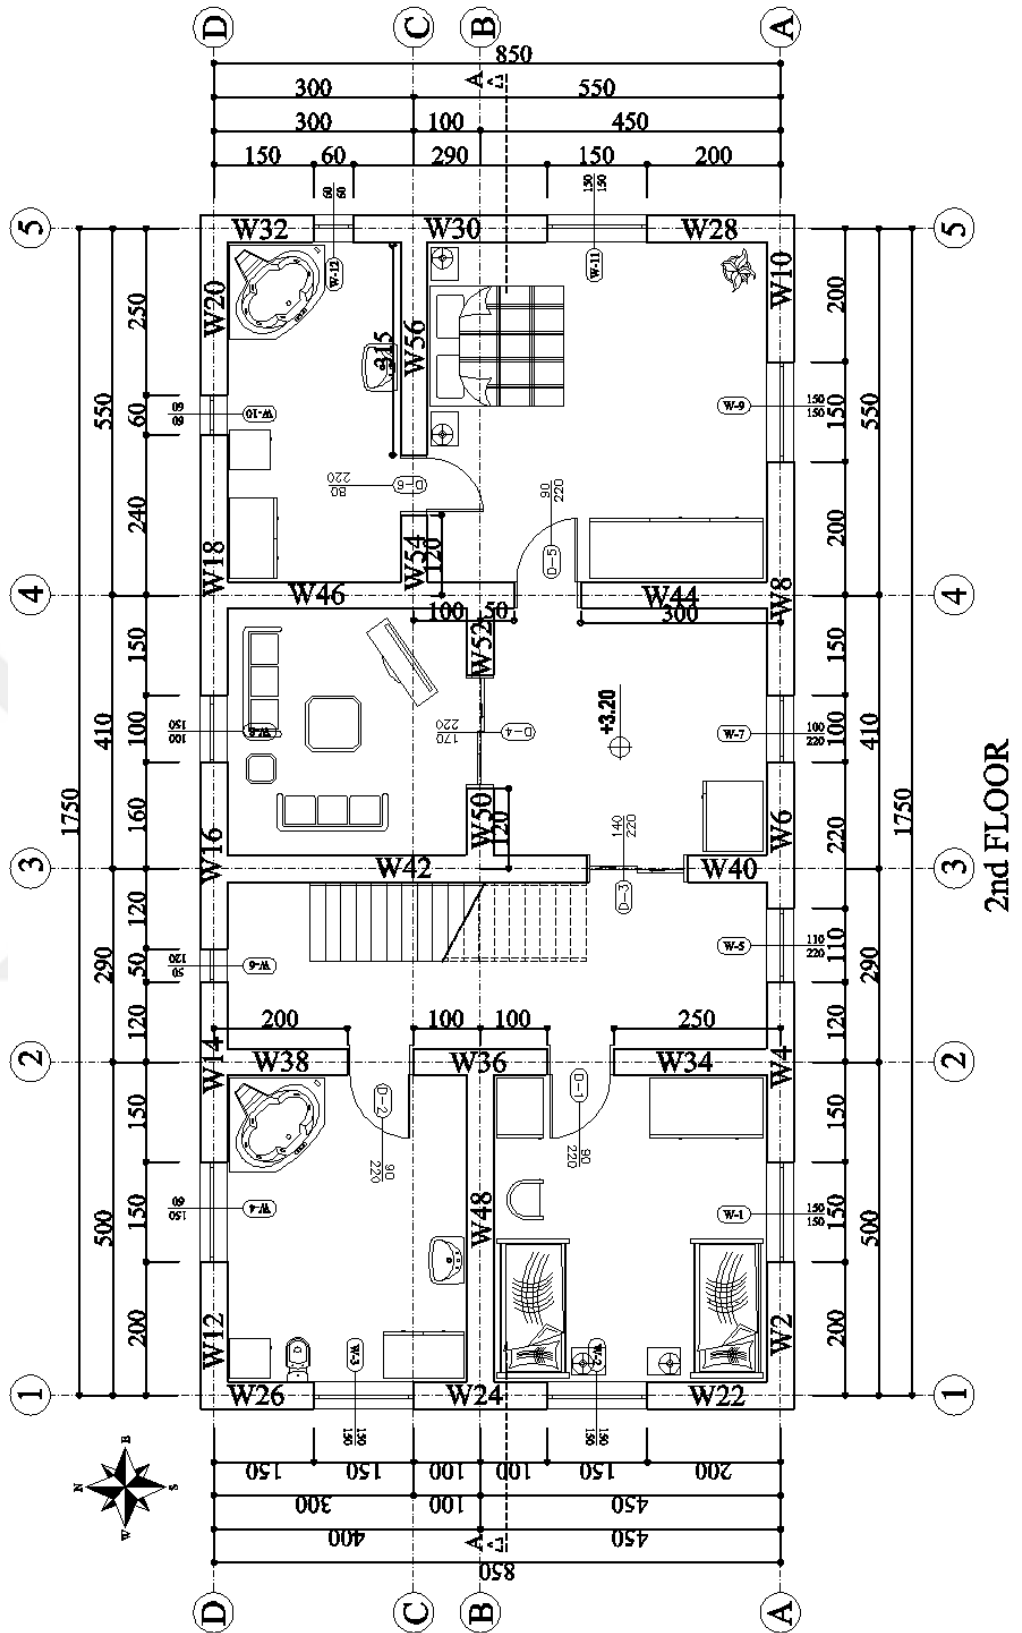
2nd Floor Plan (All dimensions are given in cm)
